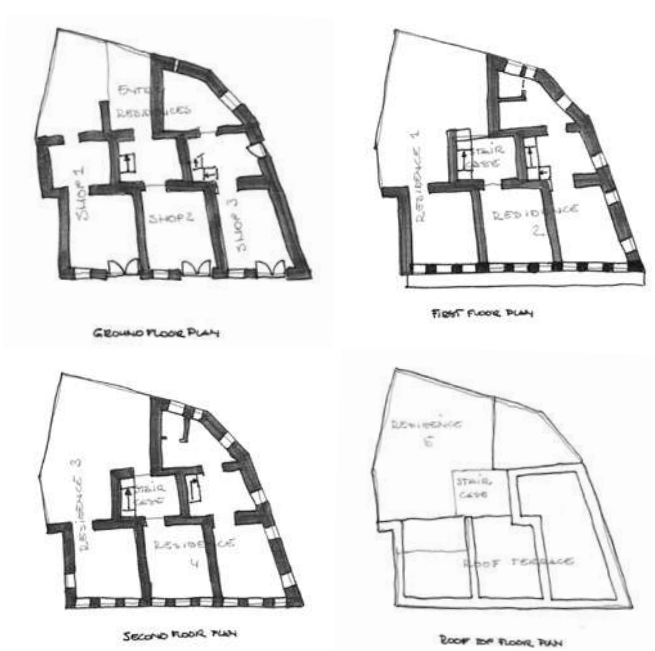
13: Quick sketch studies on the potential of the building at Soko Muhogo Street
